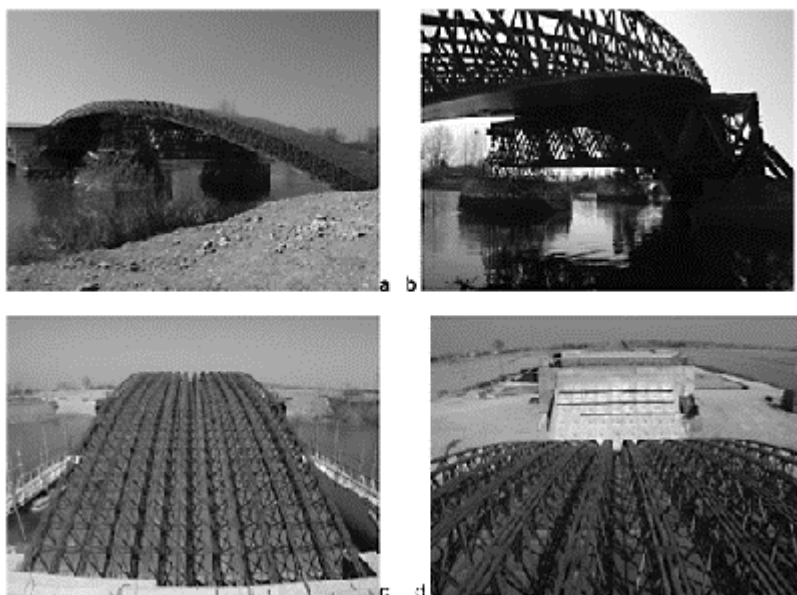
REP steel beams are set in place with just a simple provisional support at midspan. Concrete cast will follow with no formwork needed.
